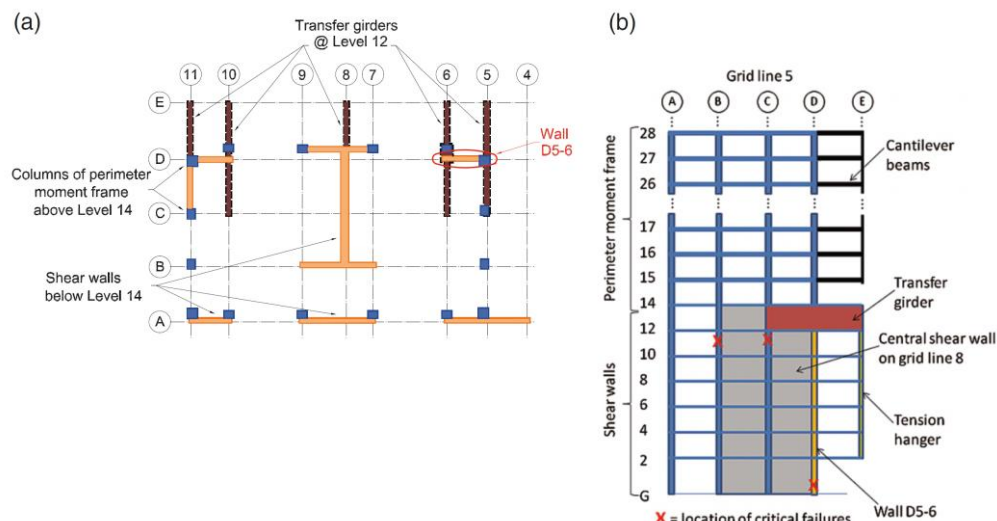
Hotel grand chancellor structural layout sketch (a) plan; (b) elevation along grid line 5 (Elwood 2013)
